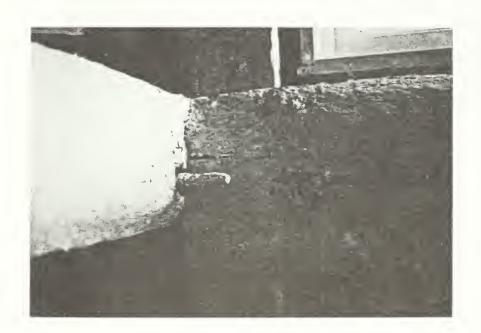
West India Goods Store, interior of second story, west wall looking west, showing pegged post-plate-trussed rafter connection between bays D and E.
